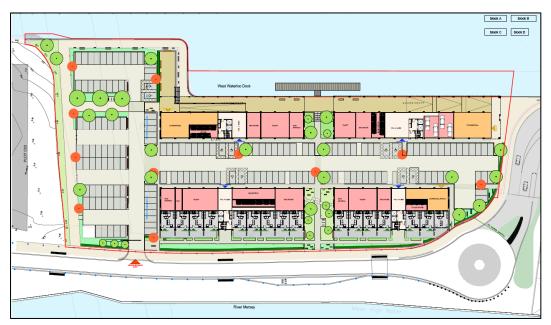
Proposed ground floor plan showing blocks A and B along the West Waterloo Dock and blocks C and D facing the River Mersey.
